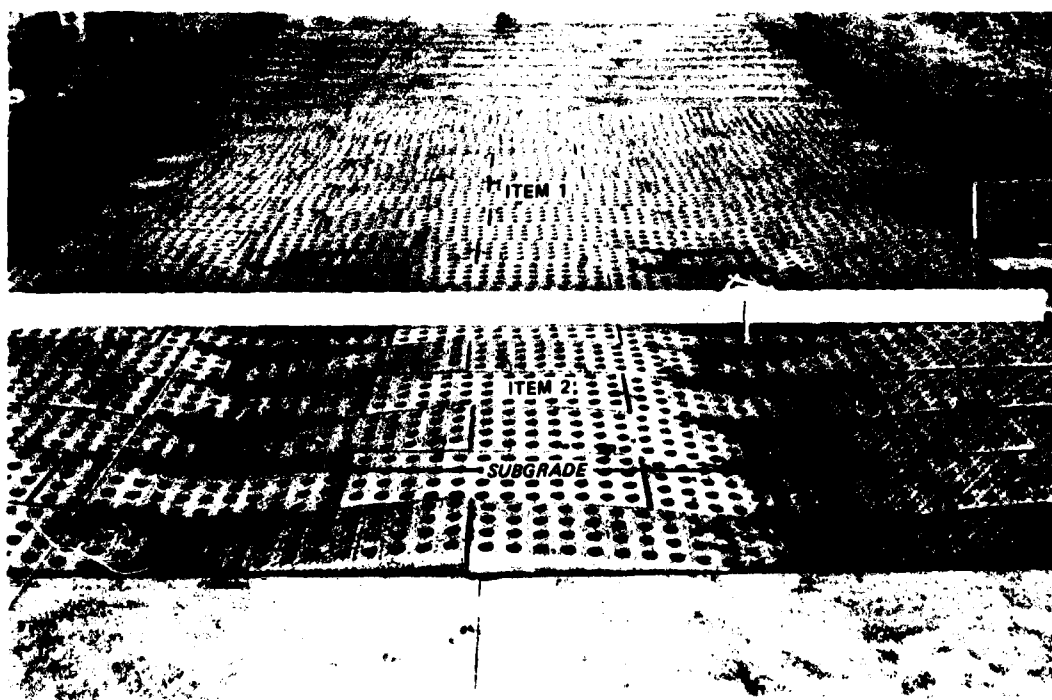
General view of test section after 50 passes with 5-ton truck; note permanent deformation and subgrade pumping in item 2, test II
